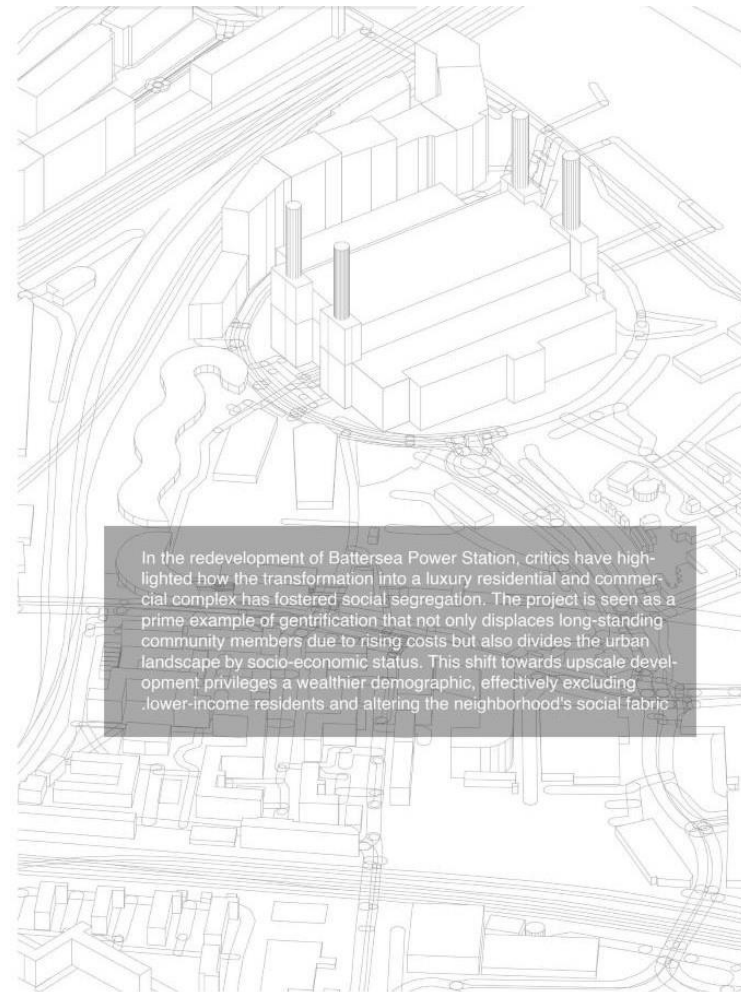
Battersea Power Station Site Plan. (Elaborated by author)
